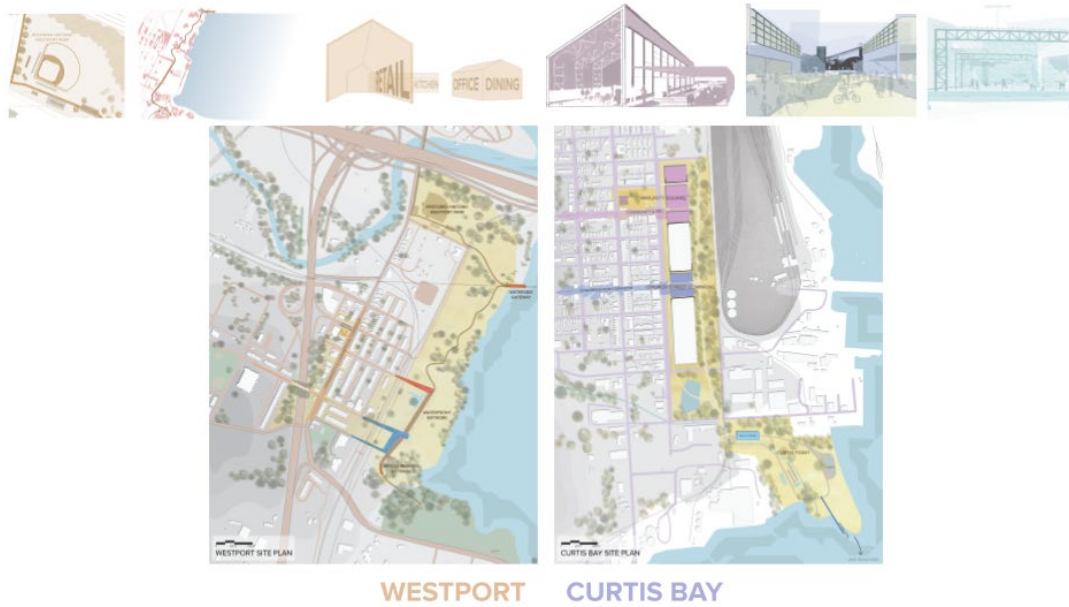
Proposed Site Plans with Interventions Across the Top (created by author)
